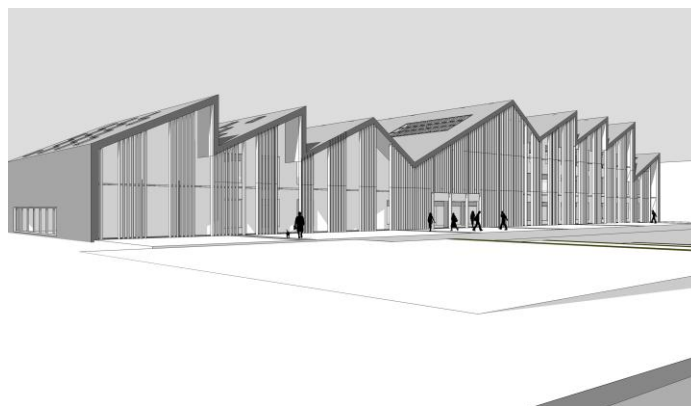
Axonometric view of the building (North-East façade, pre-design status)
